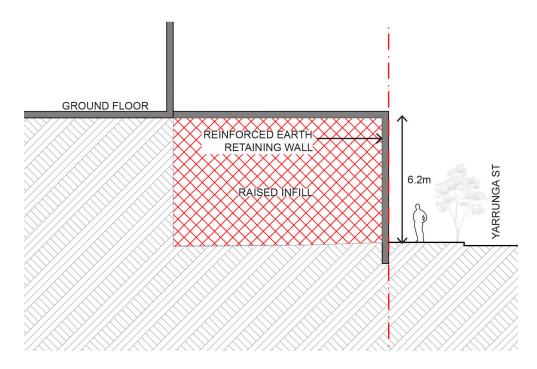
5-35 Yarrunga St sectional diagram showing relationship to existing street level.
